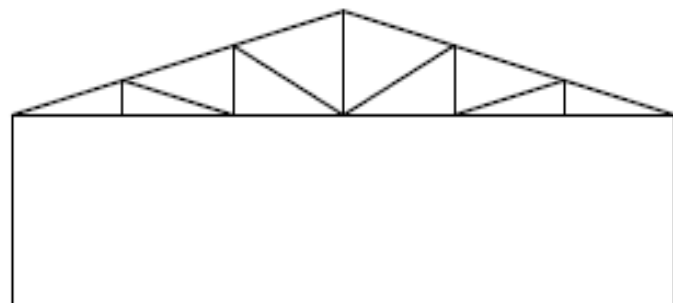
Truss Framed Roof (Simms and Newman, 2002)
